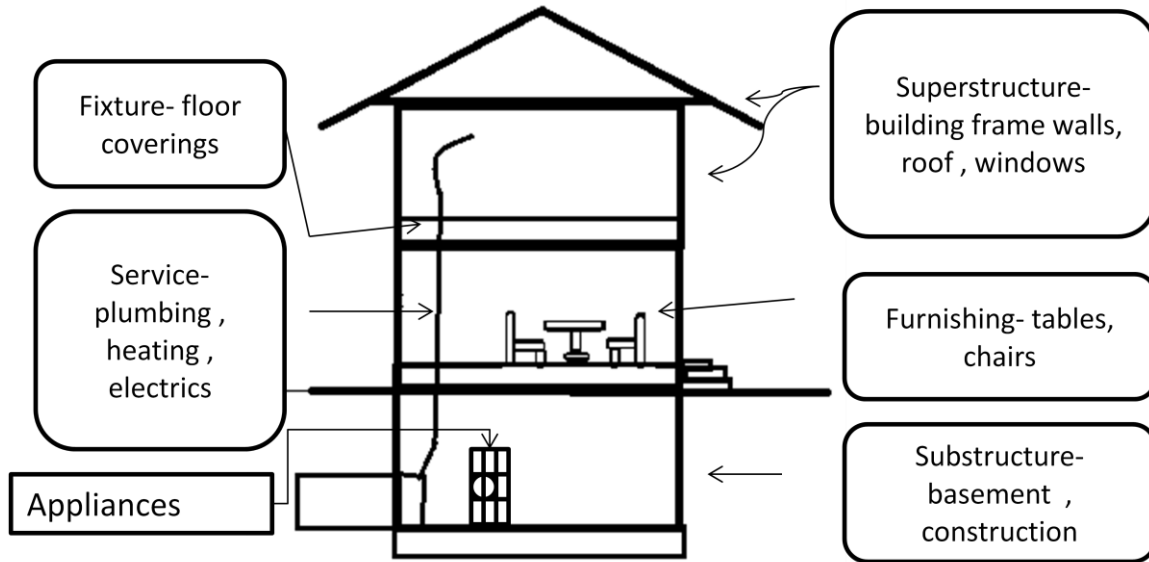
House structure Section Drawing. Created by Pin-hao Huang (May 2014)
